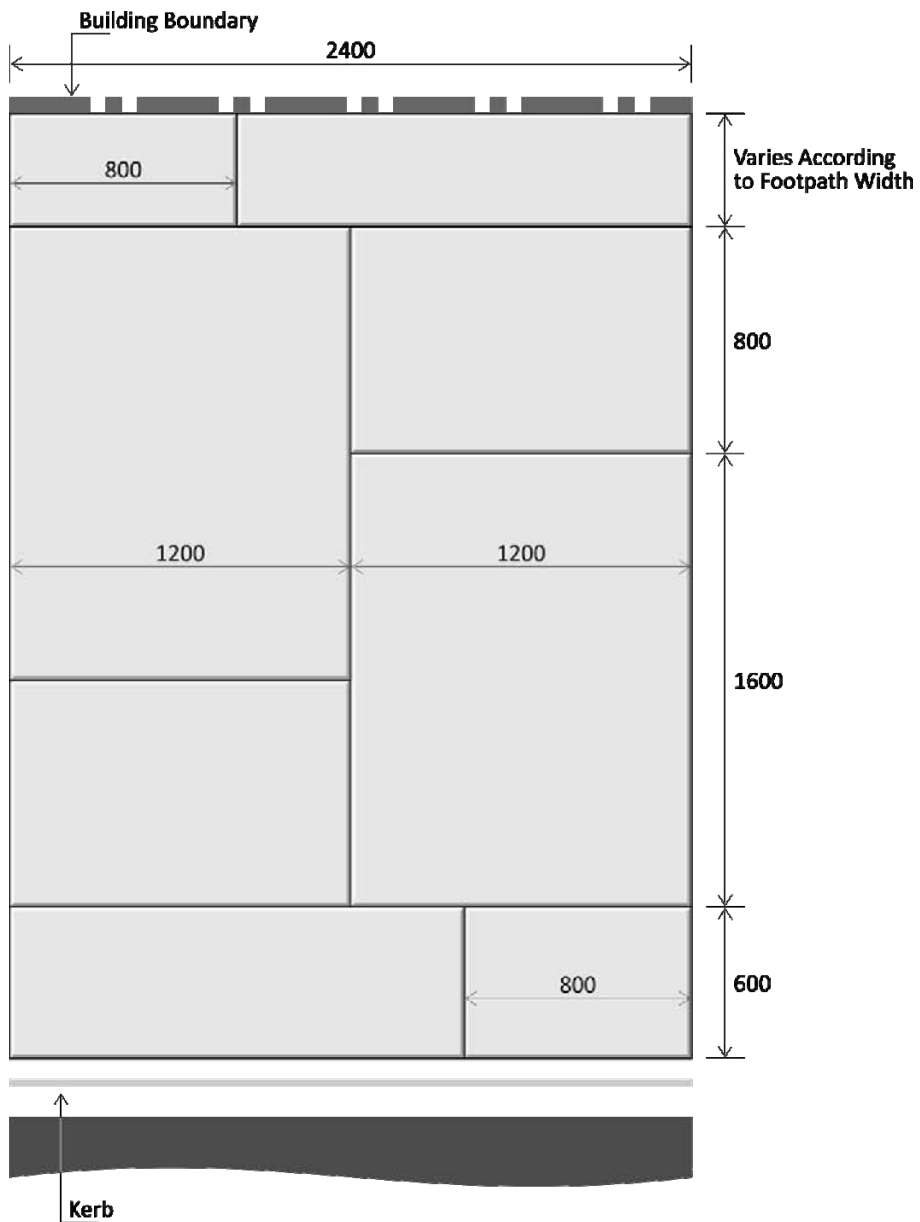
Pavement Type 1 - Sawn Cut Pattern 'B'
